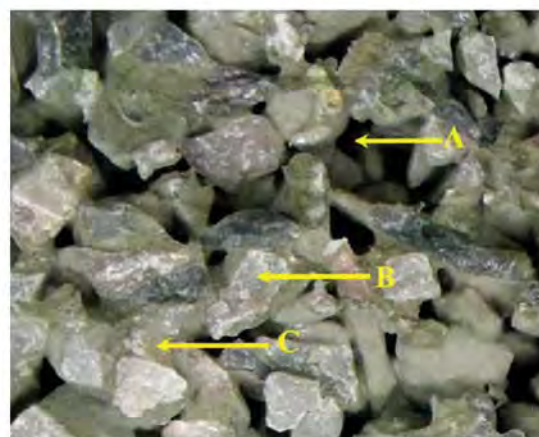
Fracture surface of PGC containing NA; (A) void; (B) failure at bond; and (C) geopolymer paste.
